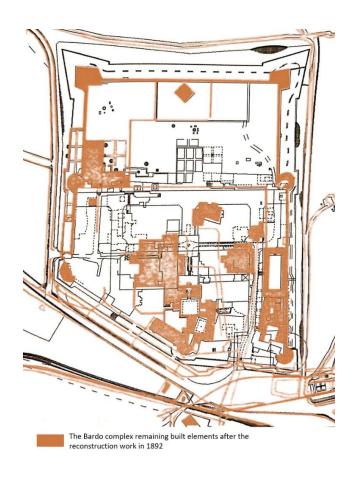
Overlapped historic plans of the Bardo complex before and after the elimination of built elements (Edited by the author)
